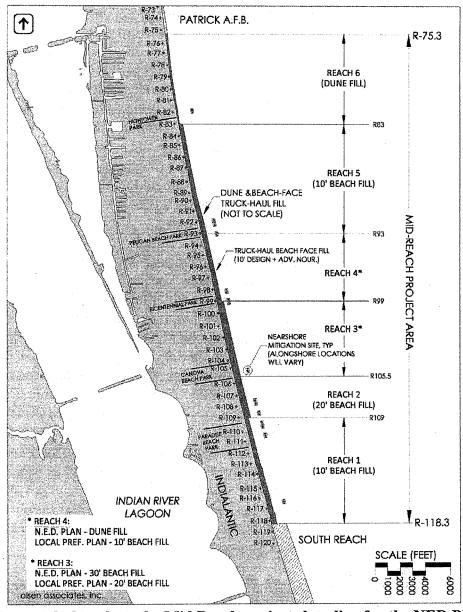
Proposed plan along the Mid Reach project shoreline for the NED Plan and HASDRP LPP (Local Option 6). The beach fill plans (not drawn to scale) are identical for the two plans except Reaches 3 and 4.
